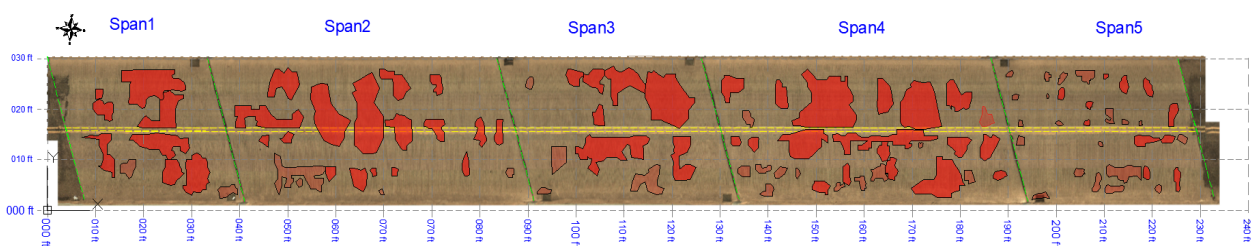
Existing Delamination in the Visual Image of Bridge Deck No. 22387
